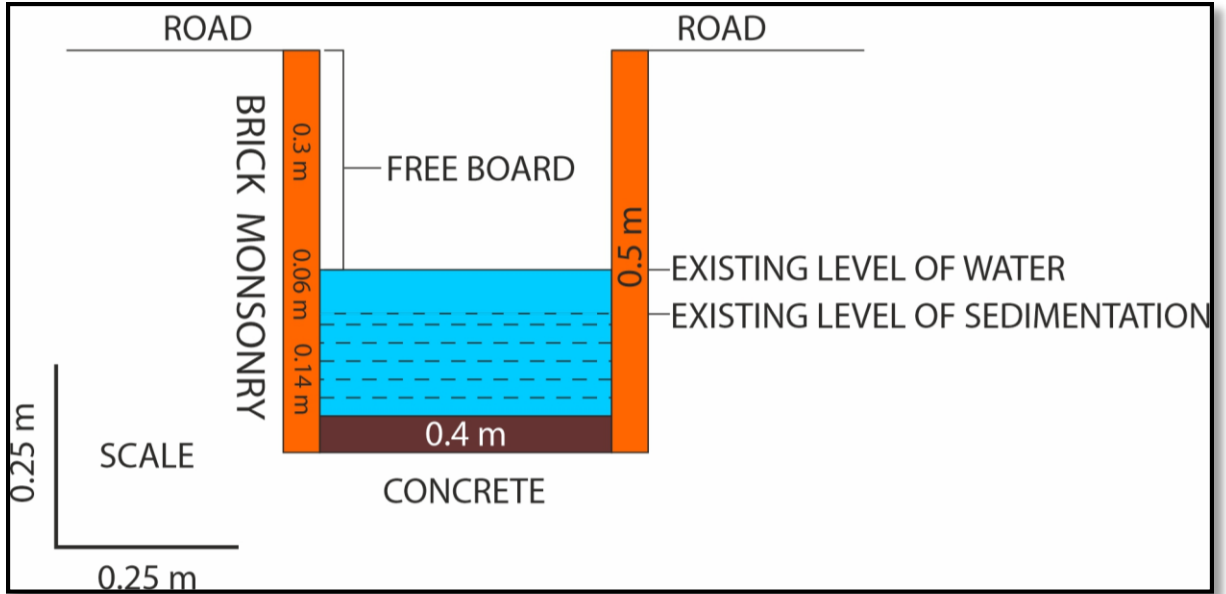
Cross Section of a Choto Pucca Drain (Small Concretized Drain)
